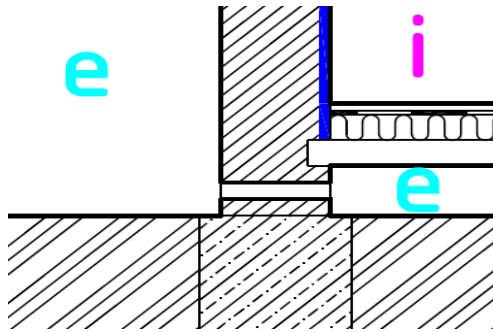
Scheme of ventilated air floor after placing the thermal plaster
